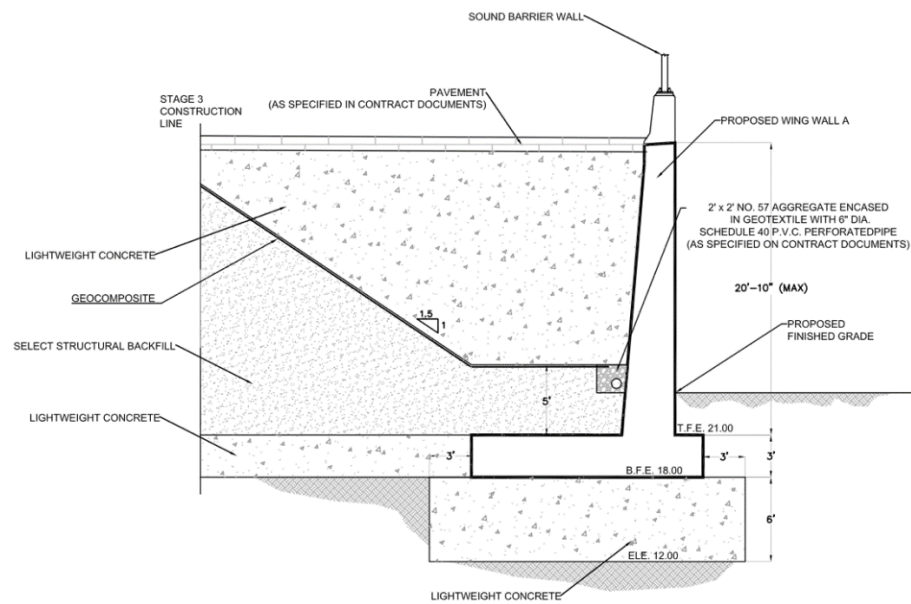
Typical cross section for Wingwall A (0095 Over Marlborough Street, S-26901).
